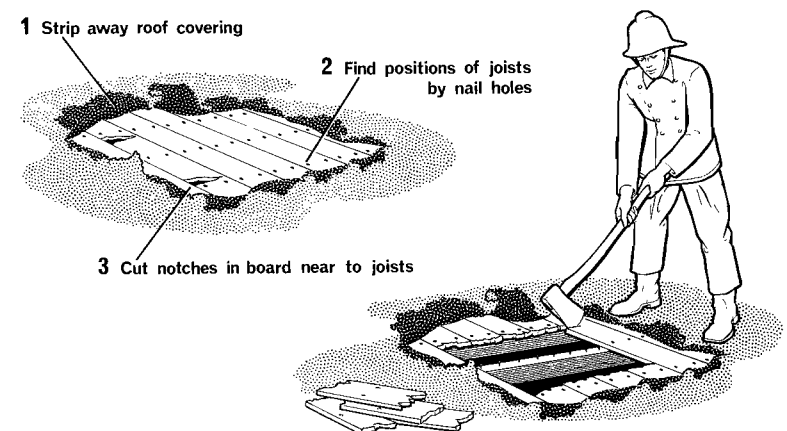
Method of using an axe to cut boarding on a flat roof.
